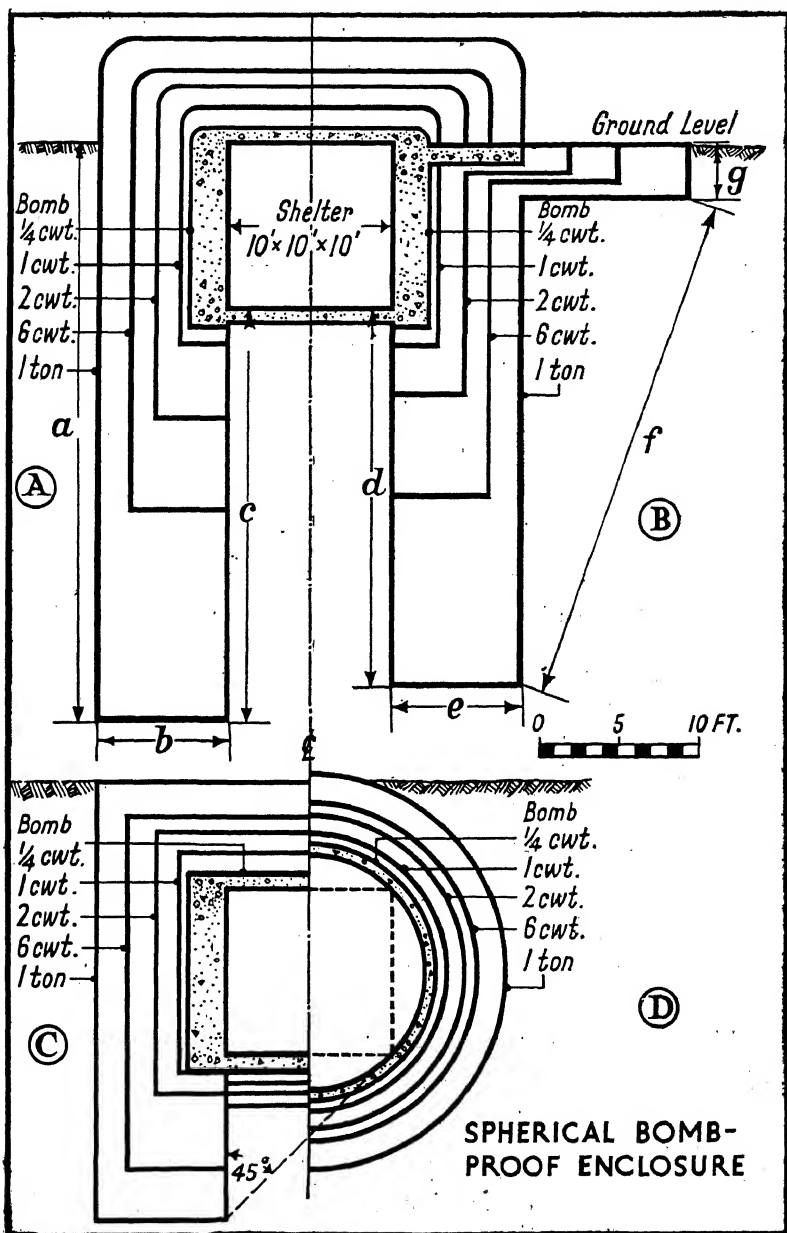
Outlines of heavy bomb-proof shelters. A and B, according to the French Government recommendations. C and D, author's proposals (see text, p. 438).
